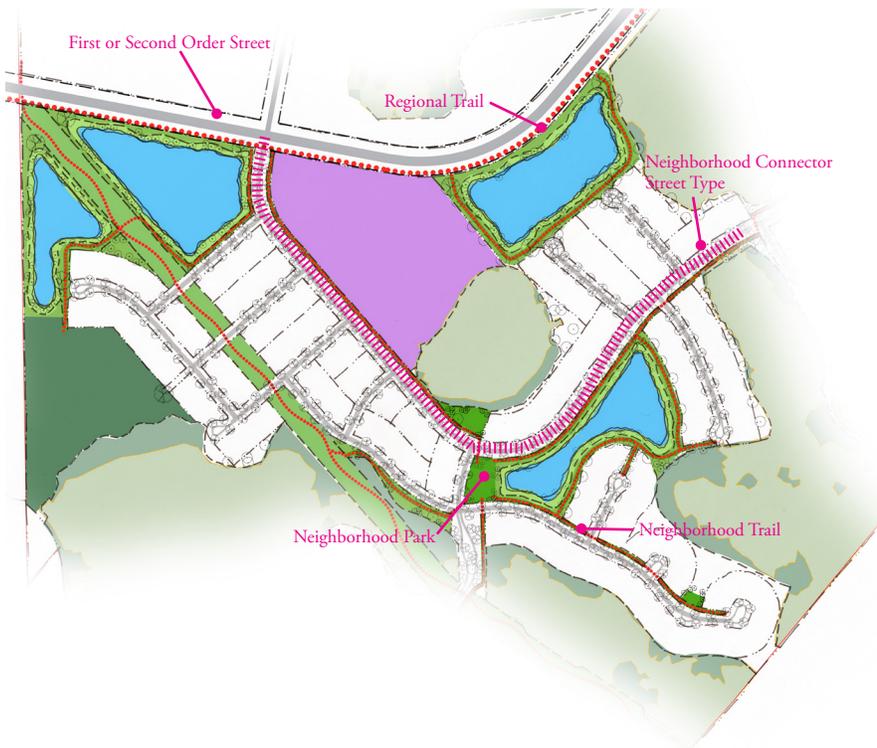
(d3): T3 - Sunbridge Neighborhood Zone Example Layout 3
